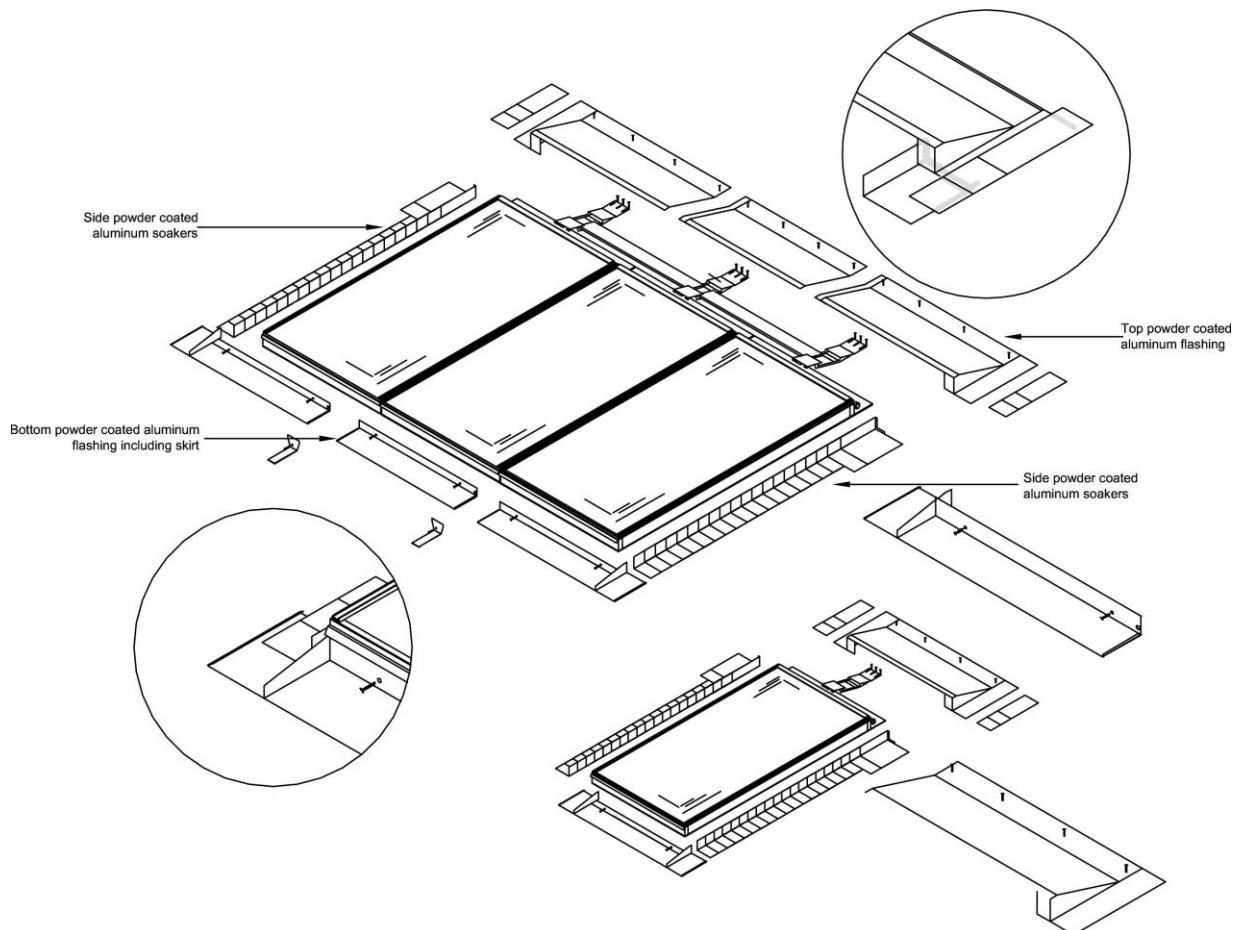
Joule VisSolis Collector - Slate Flashing Detail
